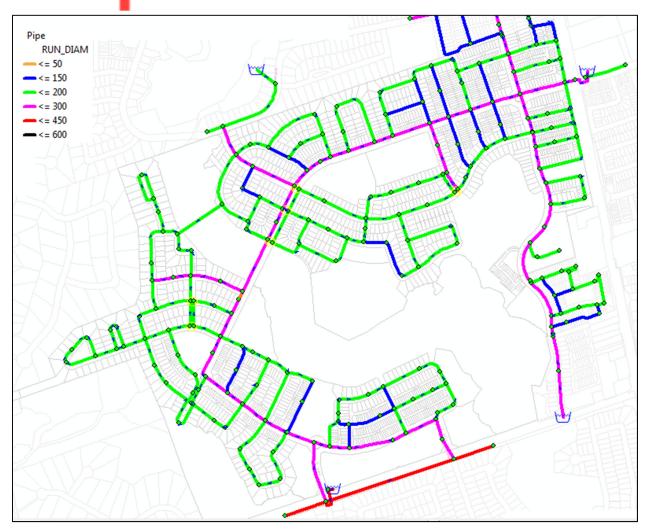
Proposed System Layout – Showing the Proposed Watermain Layout and Sizes for Full Buildout.
